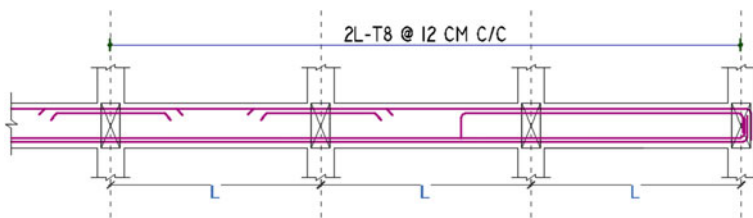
Providing continuous bottom reinforcing steel across the connection is essential to accommodating the double-span condition
